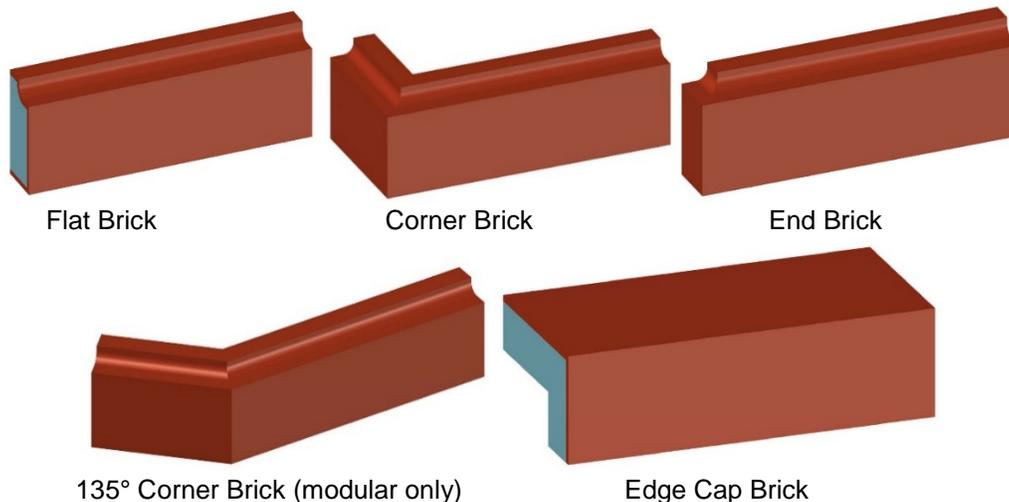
Flat Brick, Corner Brick, End Brick; 135° Corner Brick and Edge Cap Brick Configuration
